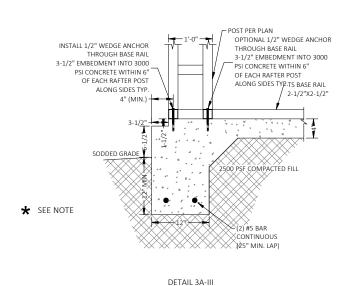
V-I CONCRETE MONOLITHIC SLAB BASE RAIL ANCHORAGE
